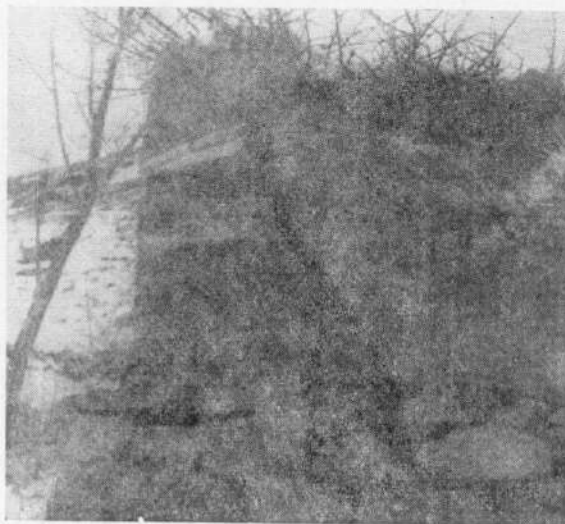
Cast insitu mud walls showing tilting and development of cracks at Shalkar village.
